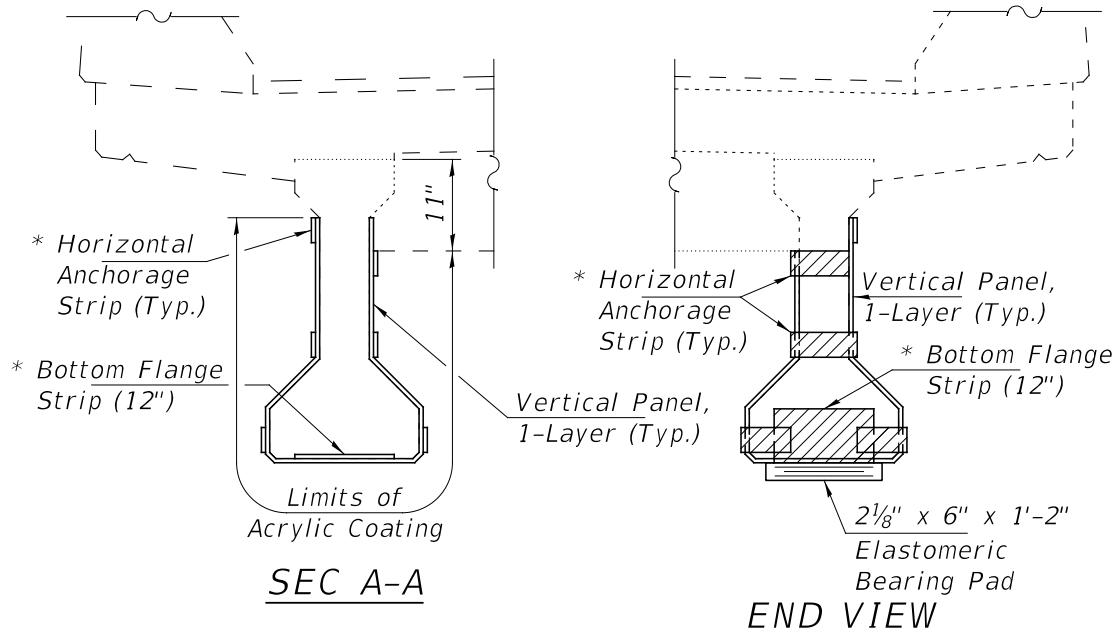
Combined PPC I-Beam End Bottom Flange Web & Shear FRP Repair 1
